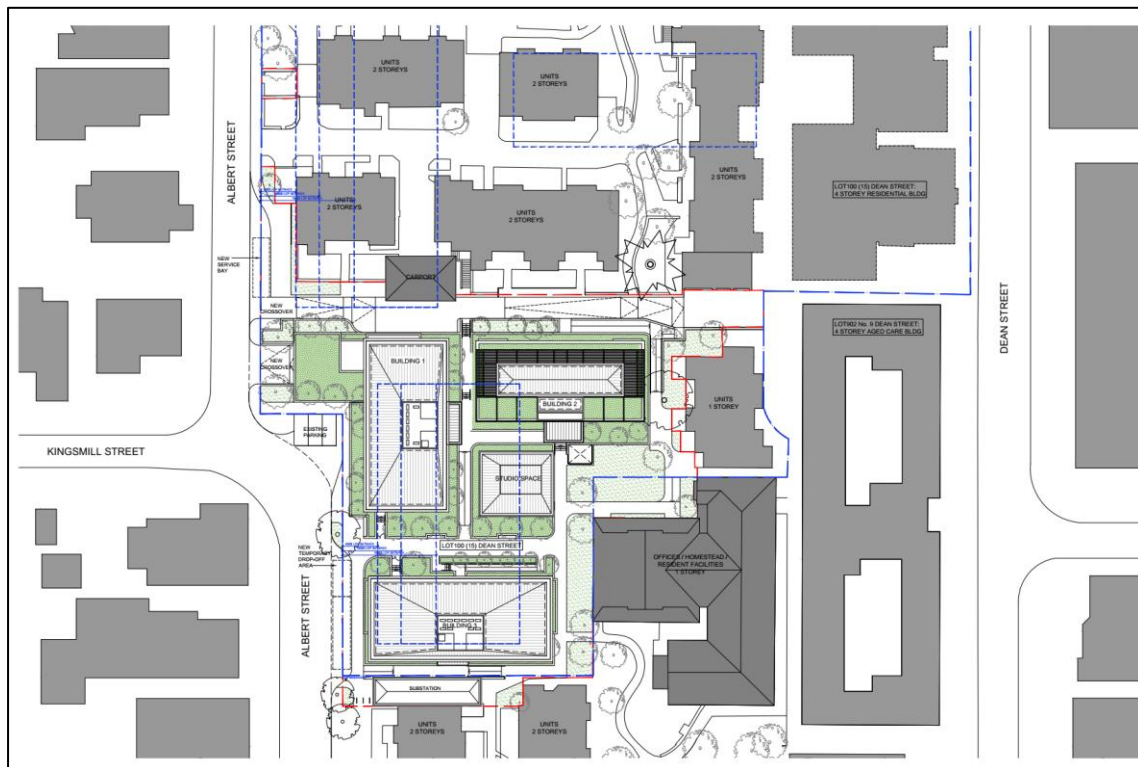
St Louis Estate Albert Street redevelopment overall site plan
